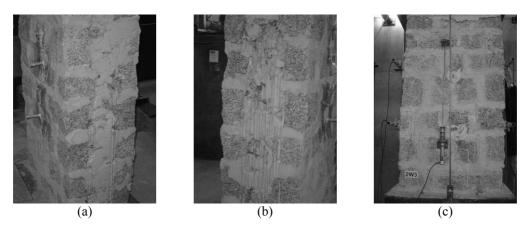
Transversal tying of a multi-leaf wall: (a) injection of the holes; (b) leakage of grout; (c) wall 2W3 under compressive loading.
